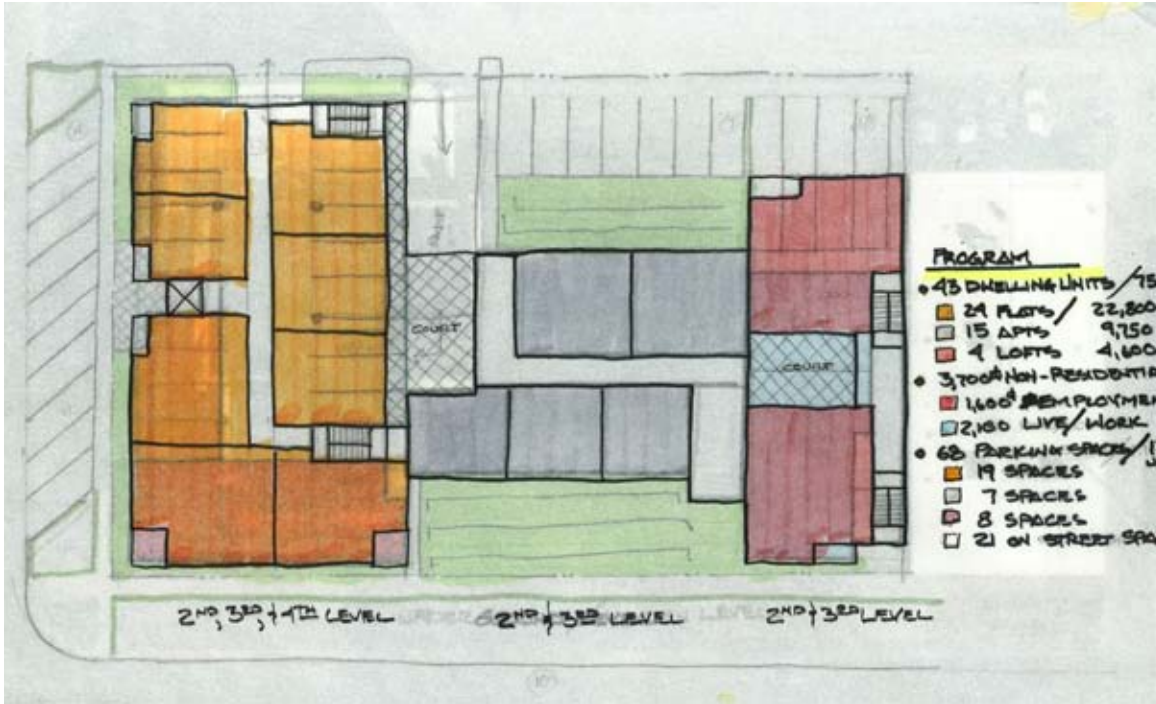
Floor plan showing the proposed layout of the second/third levels of White Hall.
